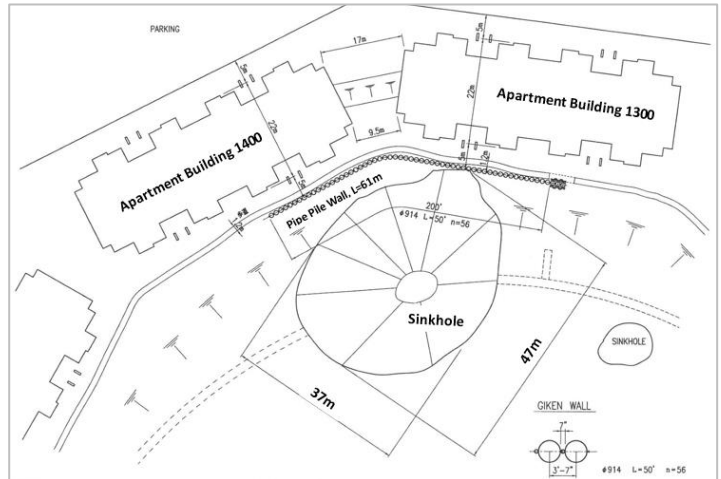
Plan View of the Sinkhole, Apartment Buildings, and Pipe Pile
